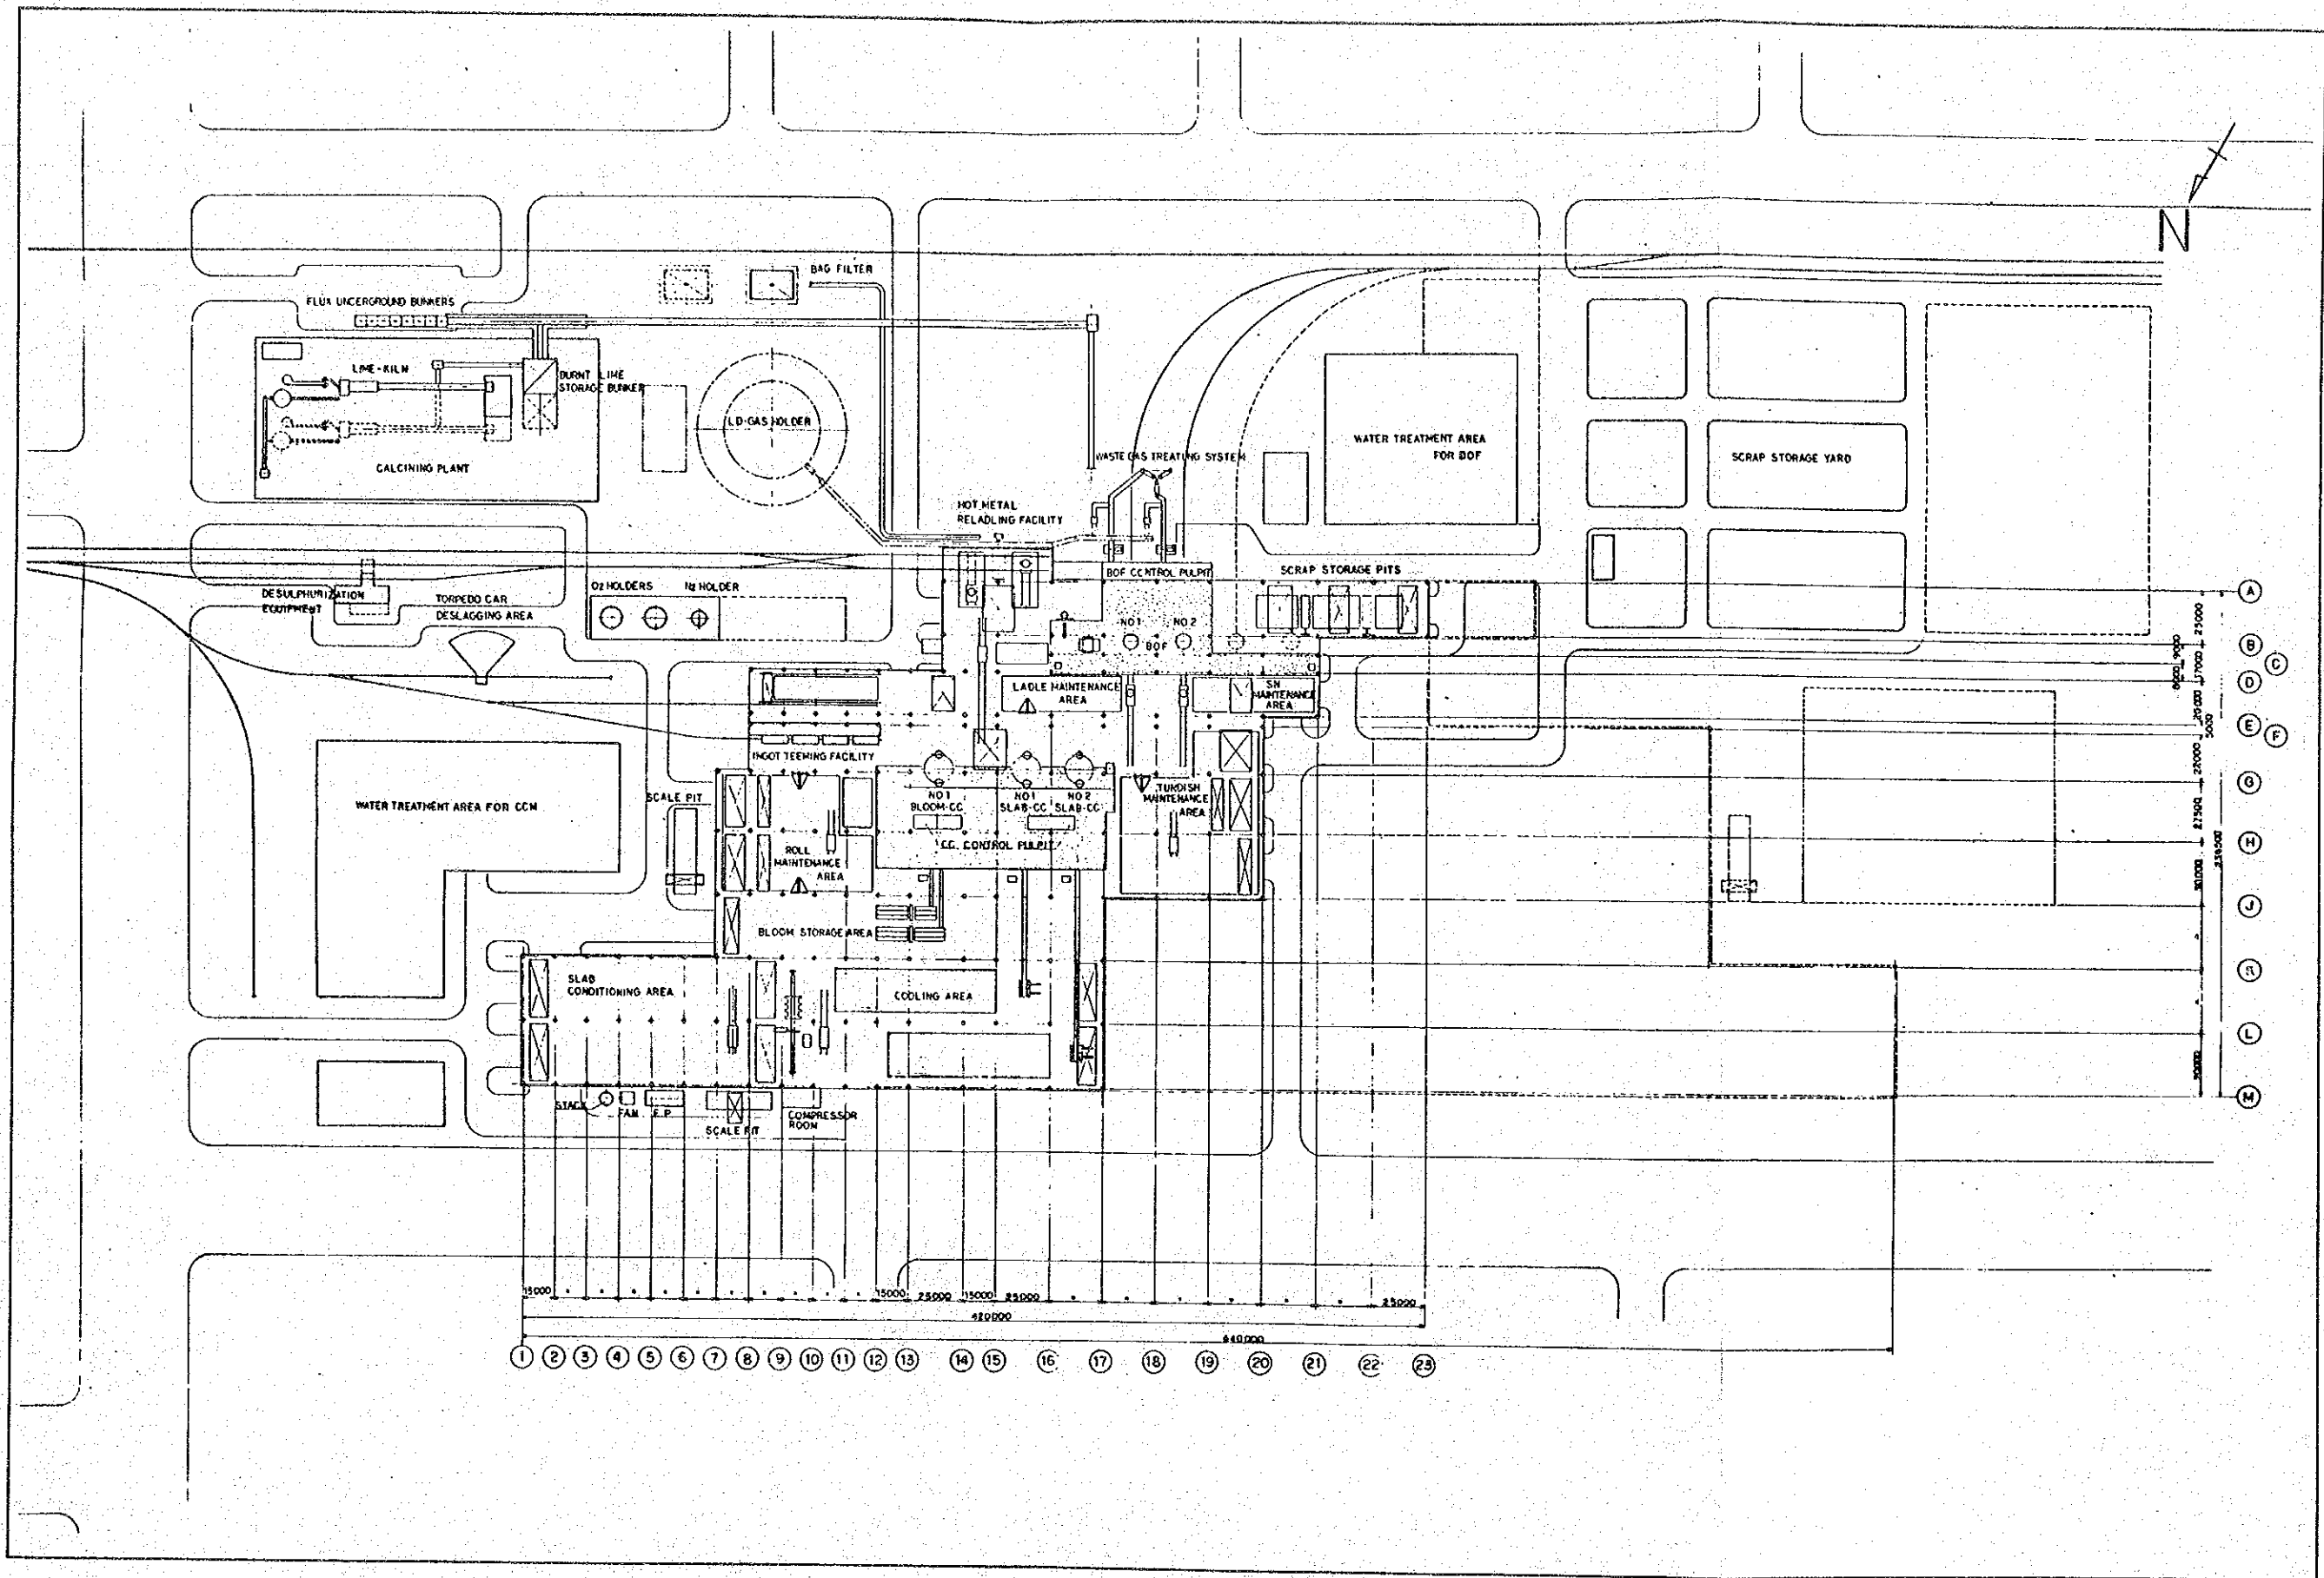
Lime calcining, B.O.F. and CC plant layout
